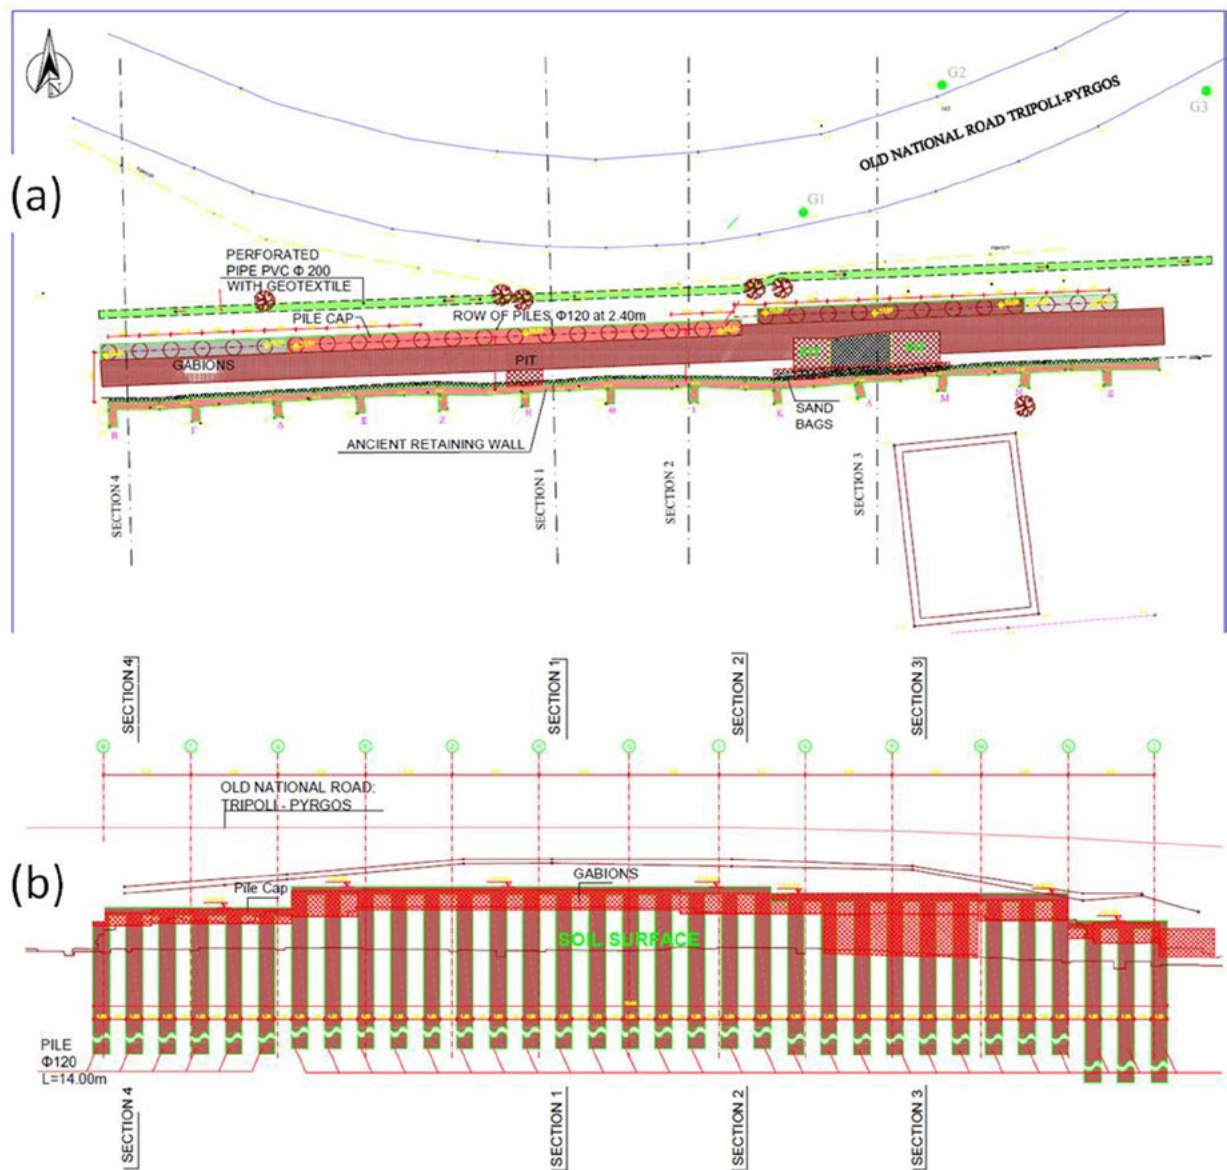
(α) Plan view and (b) Front view of retaining wall stabilization measures (Egglezos 2013b).
